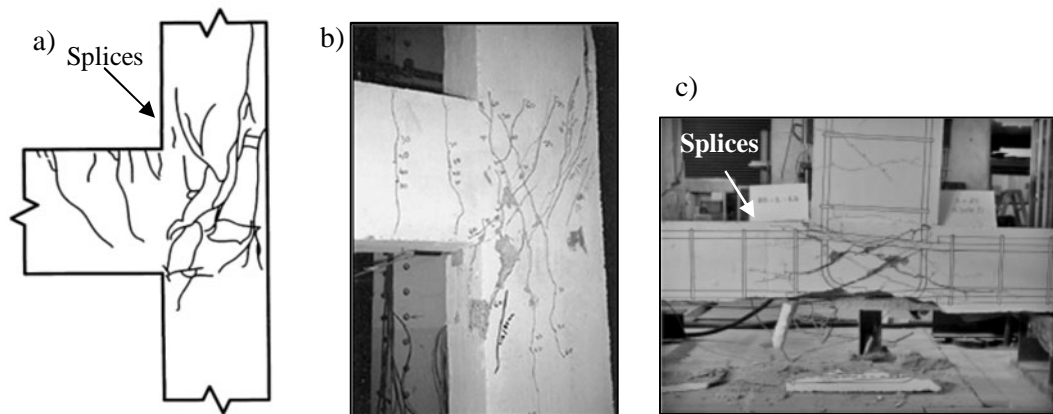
a) Typical crack pattern of substandard exterior joints observed by Beres et al. (1991), b) final crack pattern of a deficient joint tested by Ghobara and Said (2002), and c) final crack pattern for a joint with splices and L-shaped anchorages tested by Kuang and Wong (2005)
